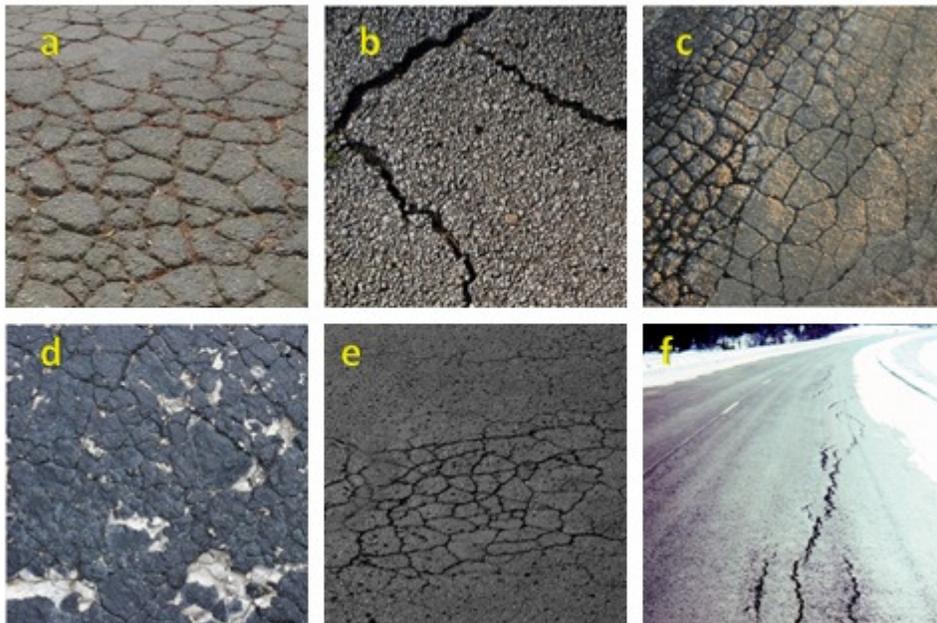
Different imperfections in the pavement: (a) spider-webbing (b) cracking (c) corroding (d) bubbling (e,f) fatigue cracking.
